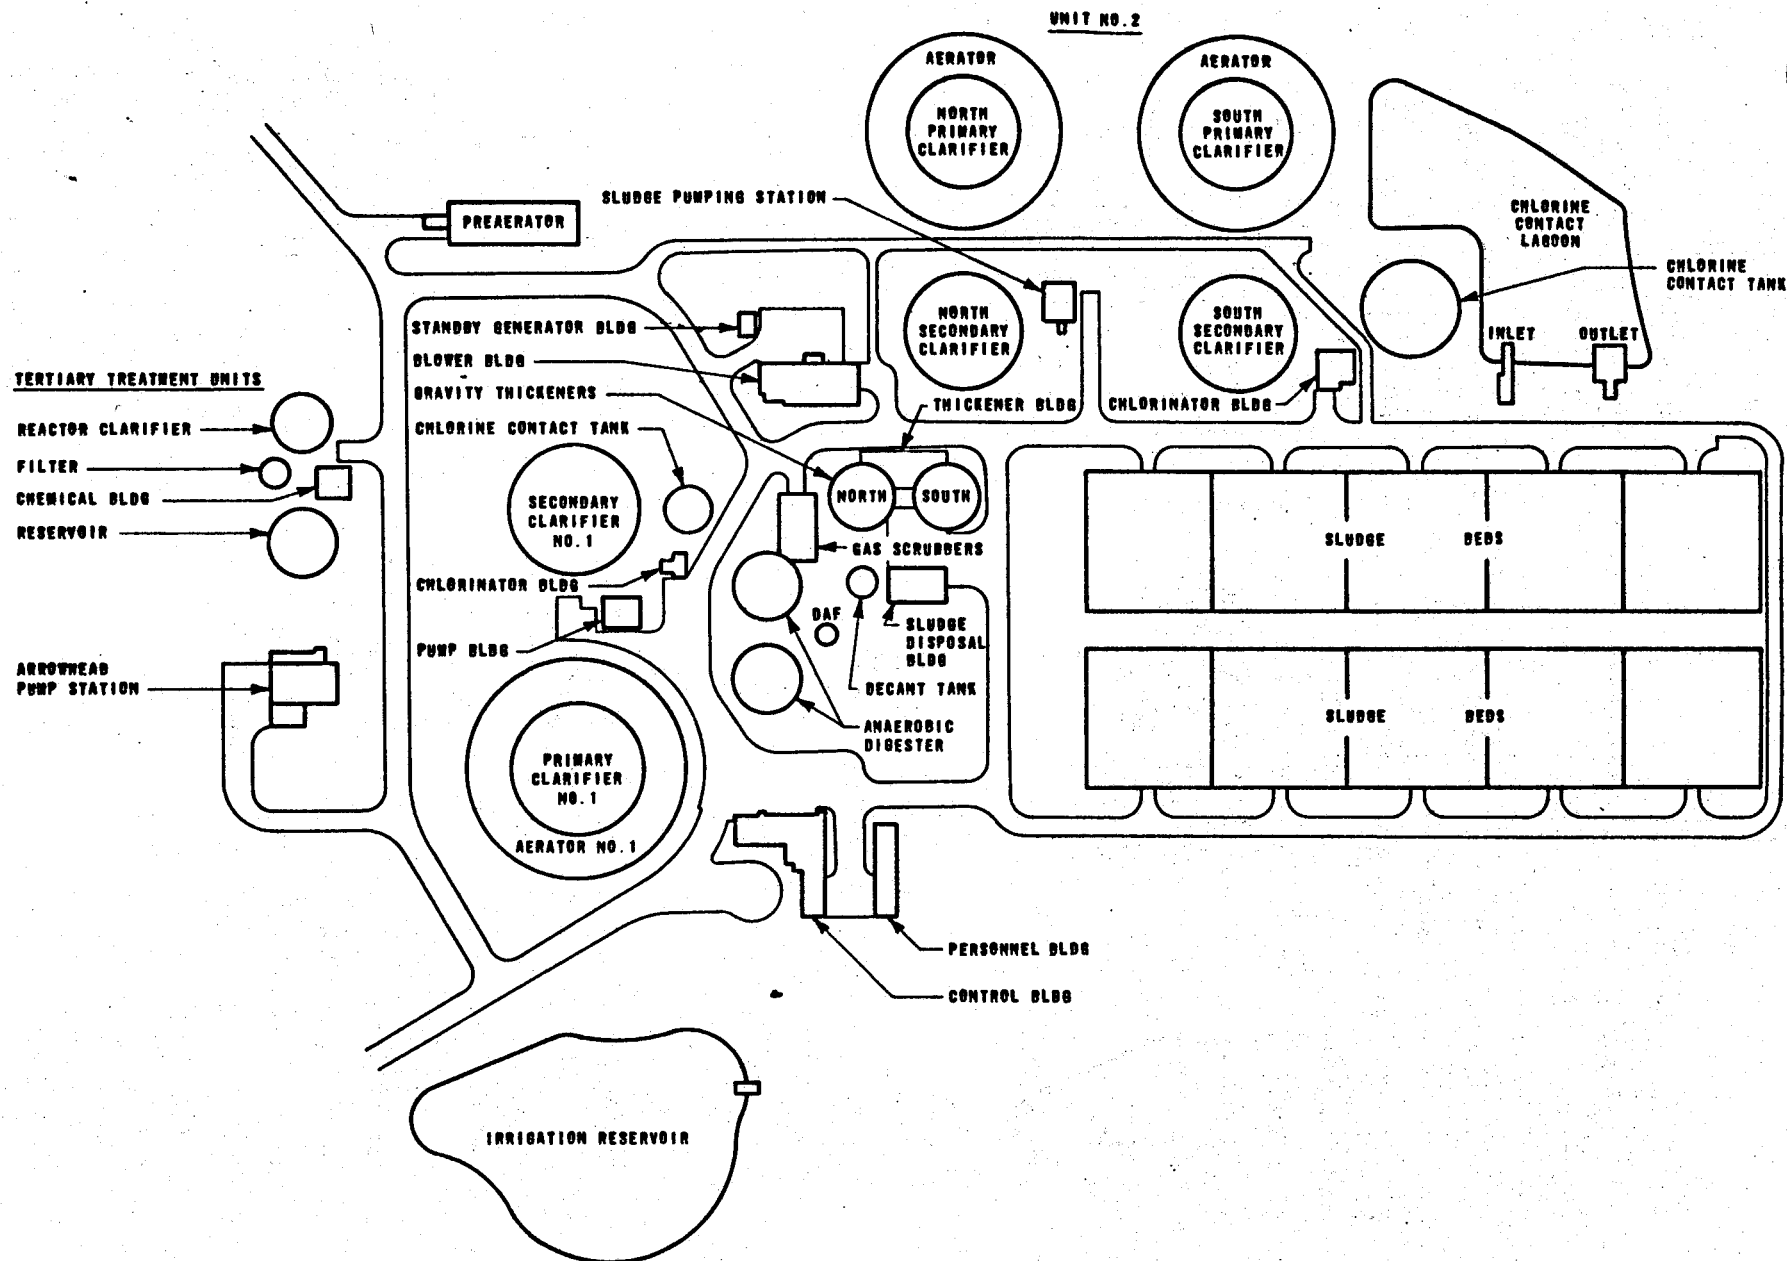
Site Plan, City of San Bernardino Wastewater Treatment Plant (From Reference 3.1)
